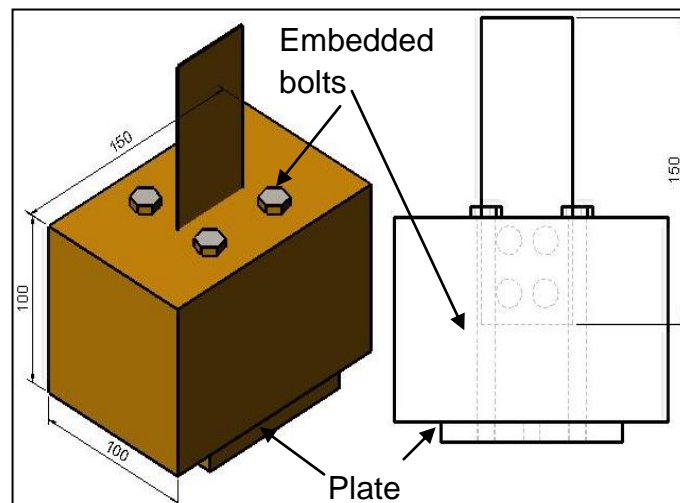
Schematic views of the location of a steel strip in foam concrete specimens between the holding-bolts
